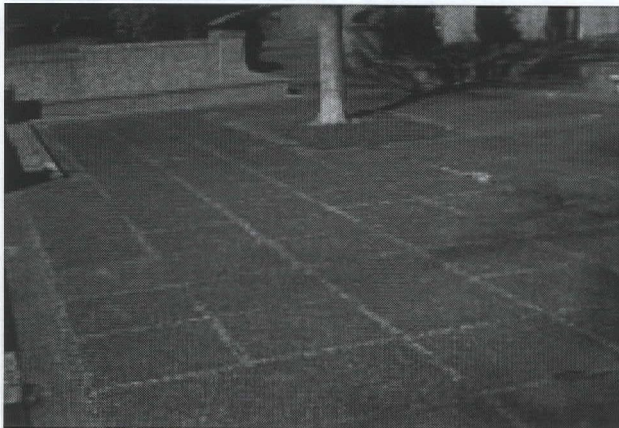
Pavement detail, west side of the reflecting pool, 1997, see plan sheet 30 (Land Ethics, Inc.).
